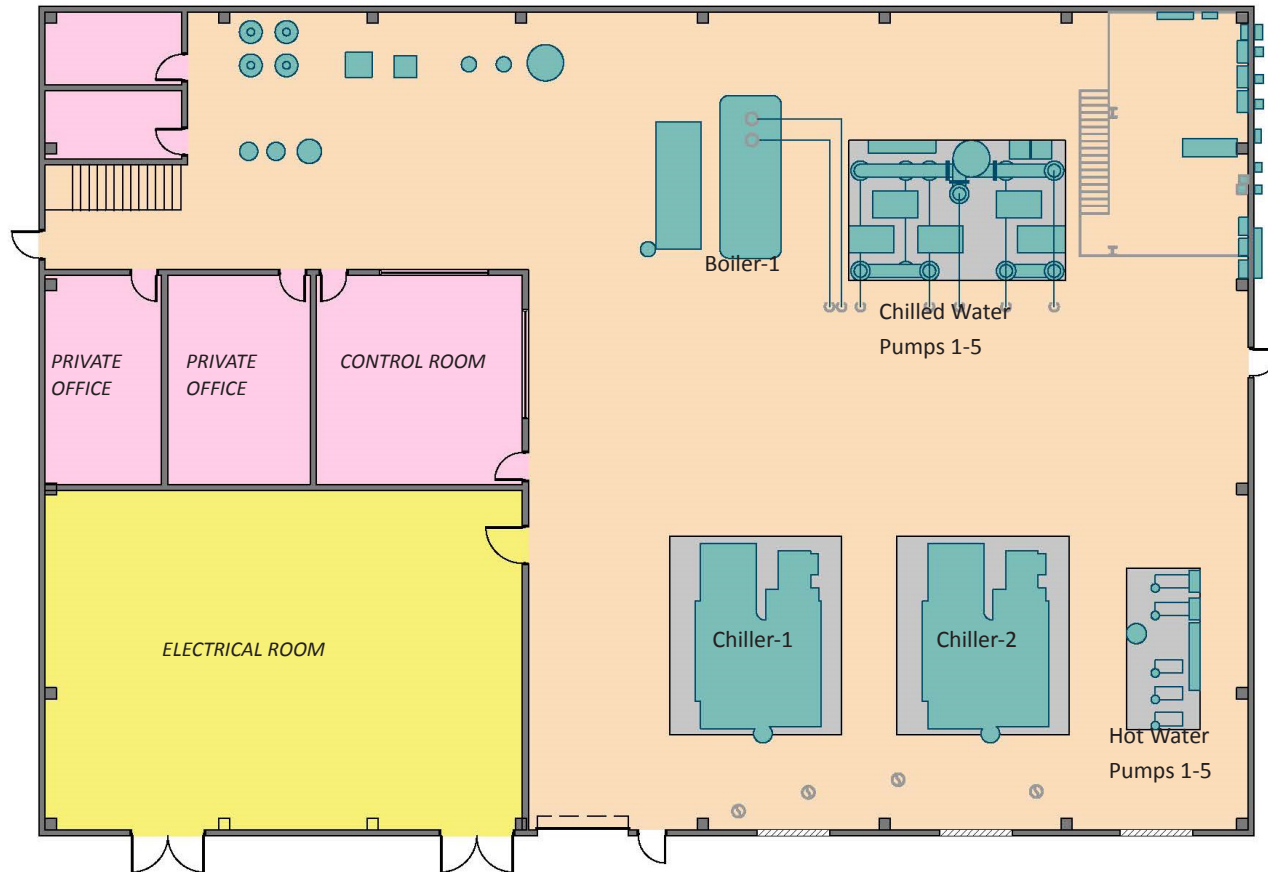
EXISTING CENTRAL PLANT LAYOUT
